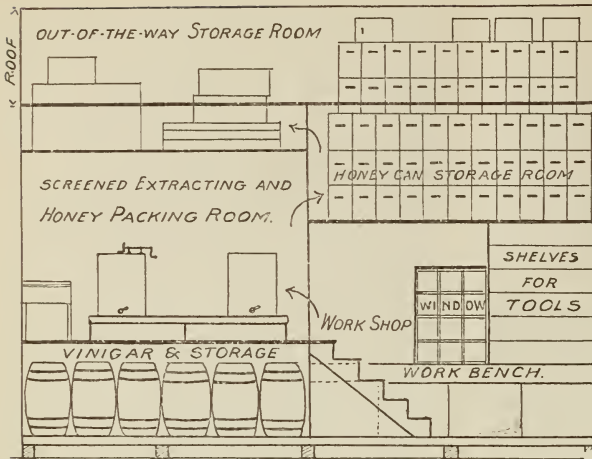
CROSS-SECTION OF SCHOLL' HONEY-HOUSE AND WORK-SHOP, SHOWING THE FOUR FLOORS.
